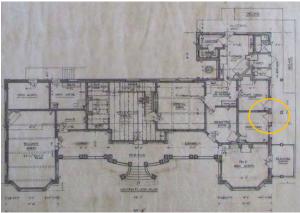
Location of subject doorway opening as shown (circled) on the original ground-floor plan serving the ground-floor bedroom.
